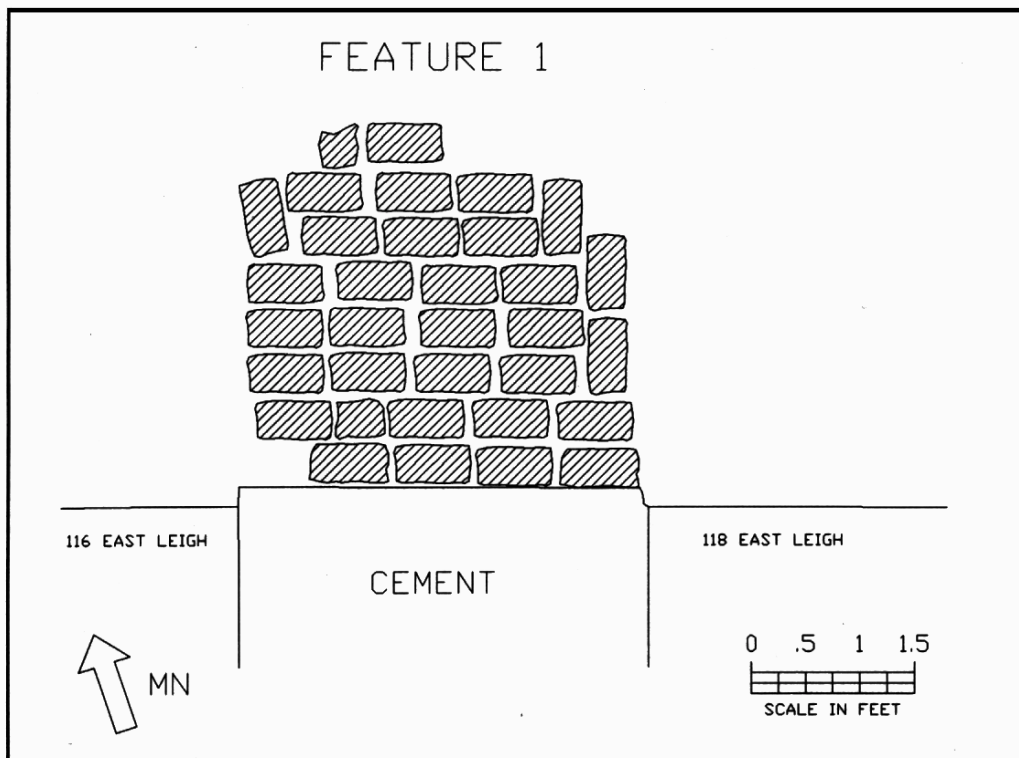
Drawing of plan view of paving feature between 116 and 118 East Leigh Street.
